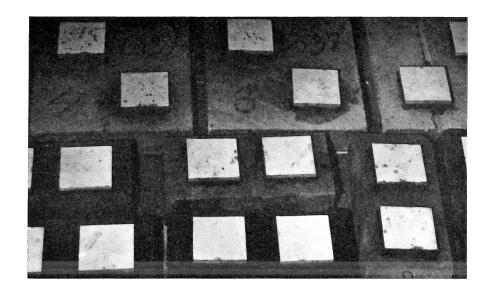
Glazed whiteware wall tiles fixed to dry and wetted clay bricks and aerated concrete slabs.
